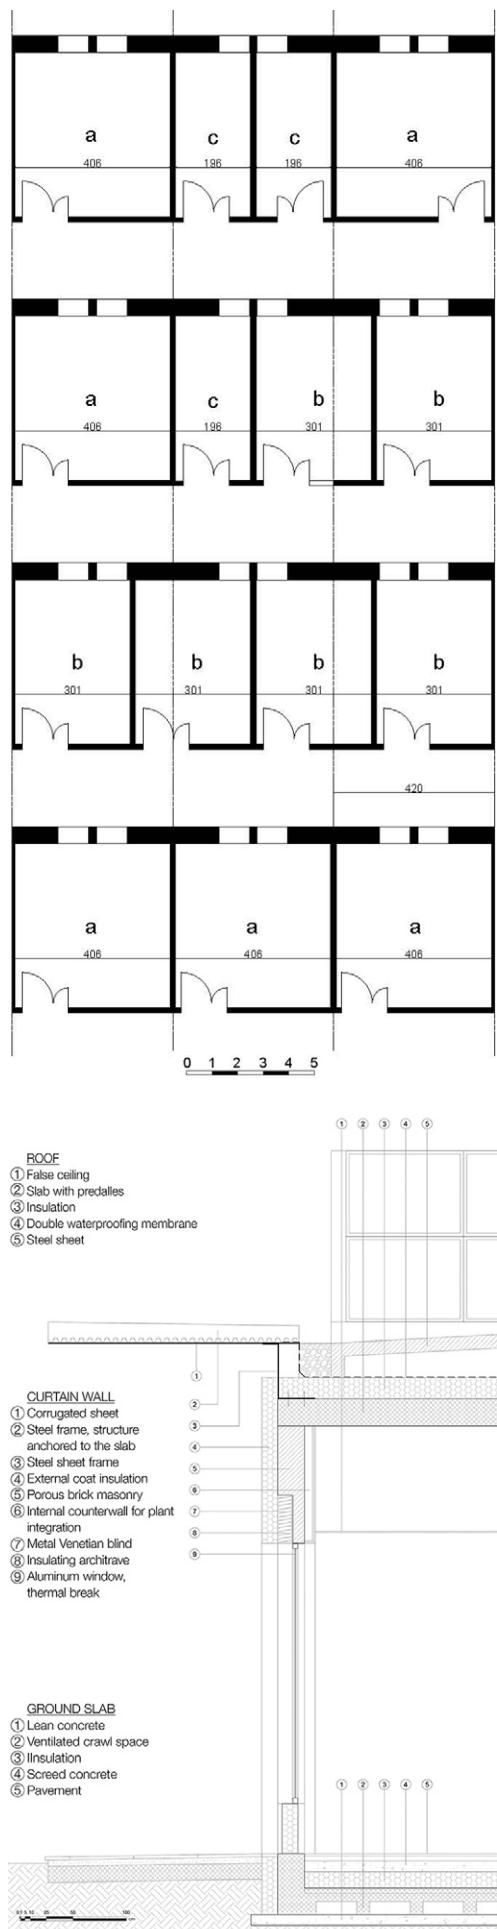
| 'Flexible' floor plans of outpatient (16 sqm, 13 sqm) and storage (9 sqm) spaces.
